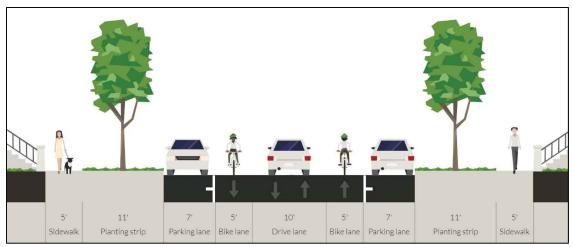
Ashley and First Street Typical Cross Section, south of William Street – Proposed
